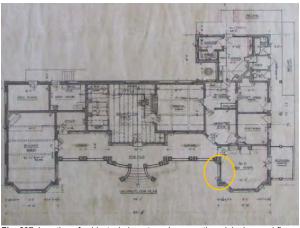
Location of subject window at as shown on the original ground-floor plan serving the ground-floor bedroom.
